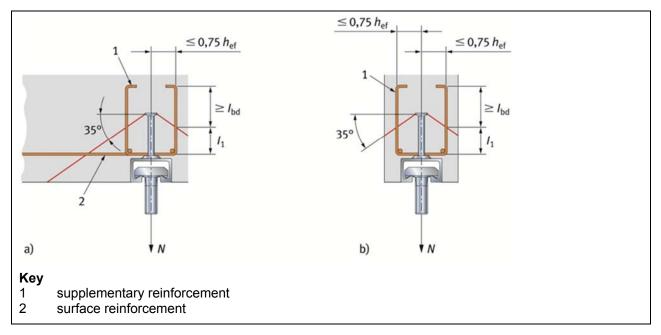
Arrangement of supplementary reinforcement a) anchor channel parallel to the edge
